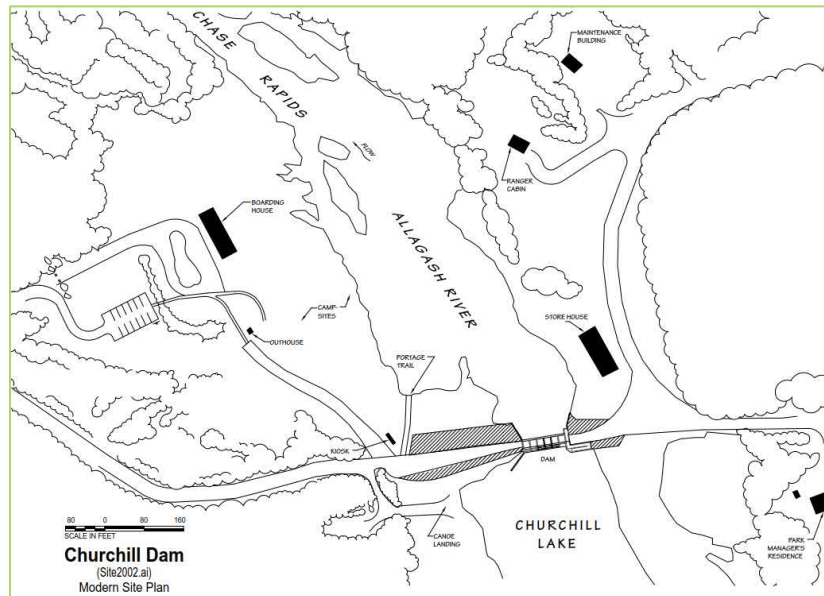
Churchill Depot site plan, c. 2002. (courtesy of BPL)
